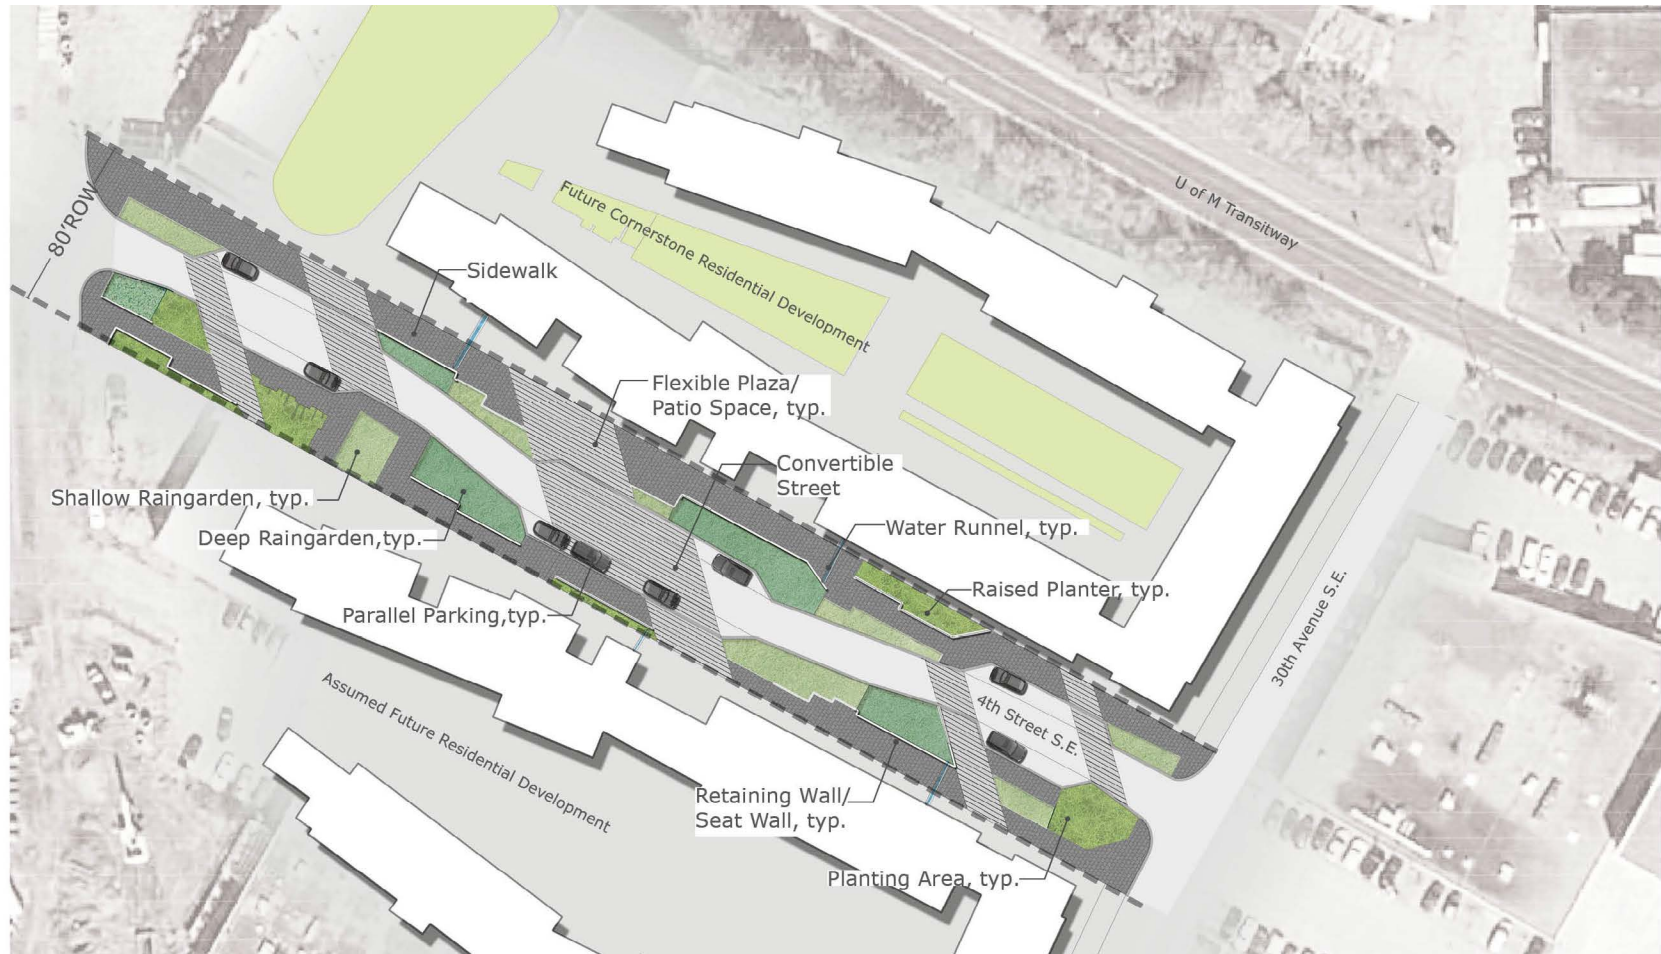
Boeser Concept Plan- Ground Plane Detail
